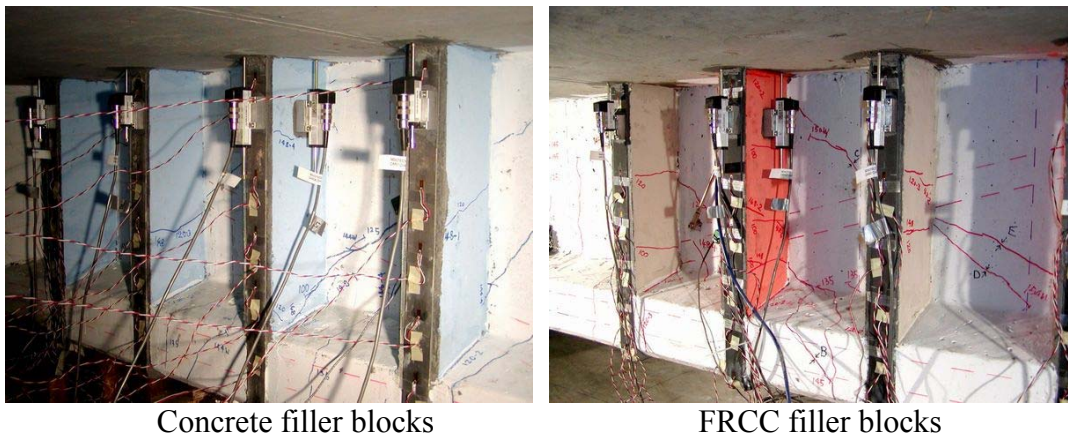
Cracks in the concrete and FRCC filler blocks
